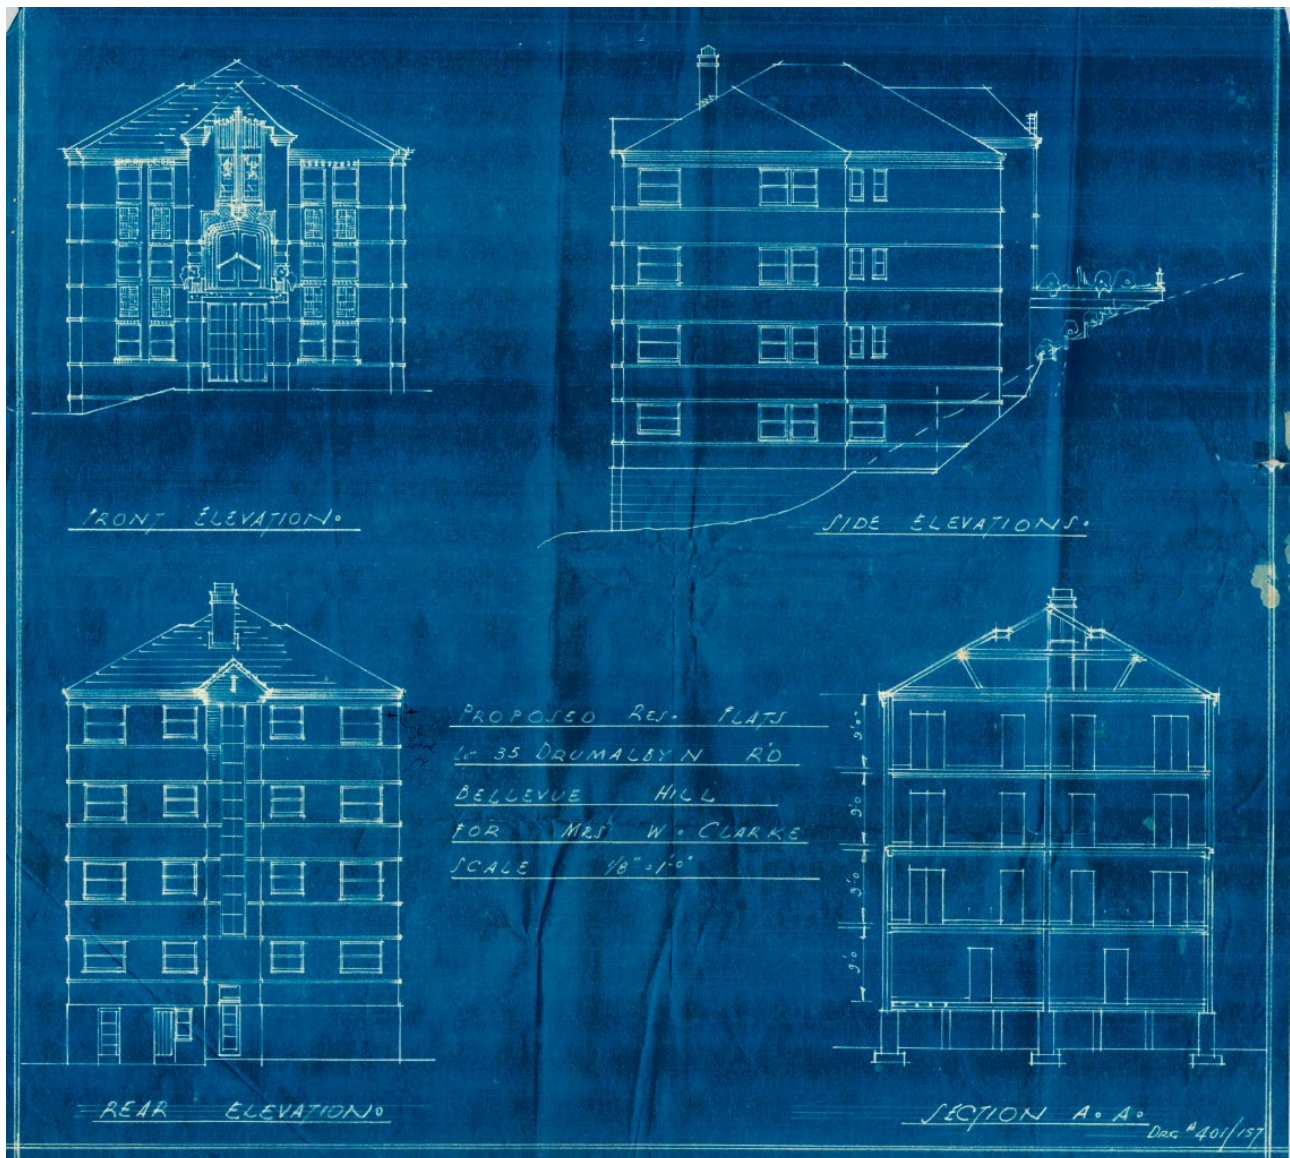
Original blueprints for 80 Drumalbyn Road, Bellevue Hill. The final design differs from these drawings primarily in the facade detailing. It seems plausible that the developer did not have the funds to complete the building as drawn.
